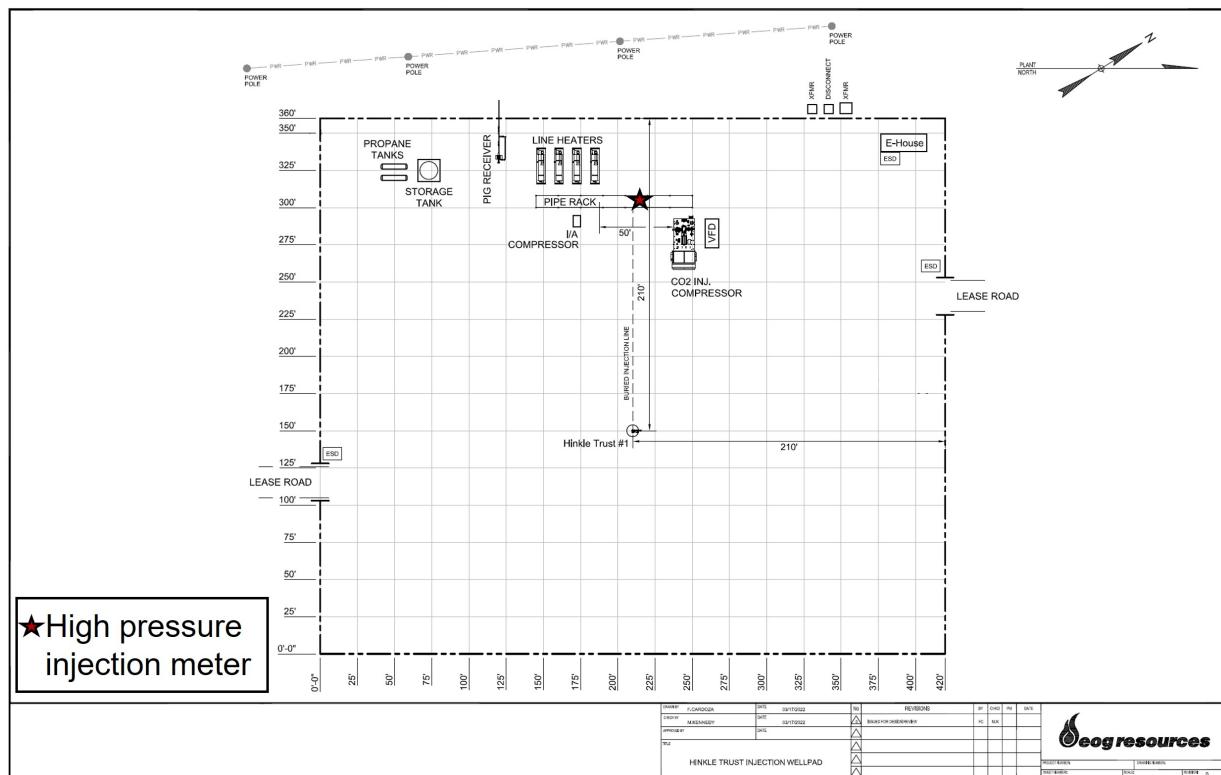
Plot plan for Hinkle Trust #1 injection pad.
